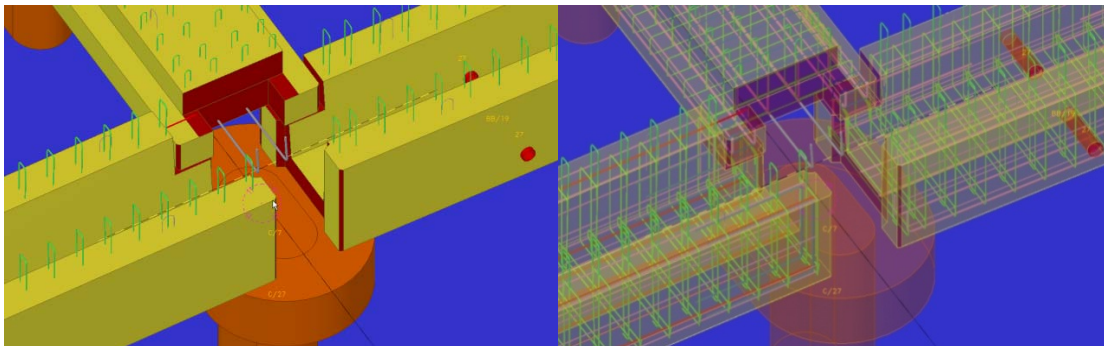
Modi'in project - prestressed concrete girders. Girders were supported at different levels.
